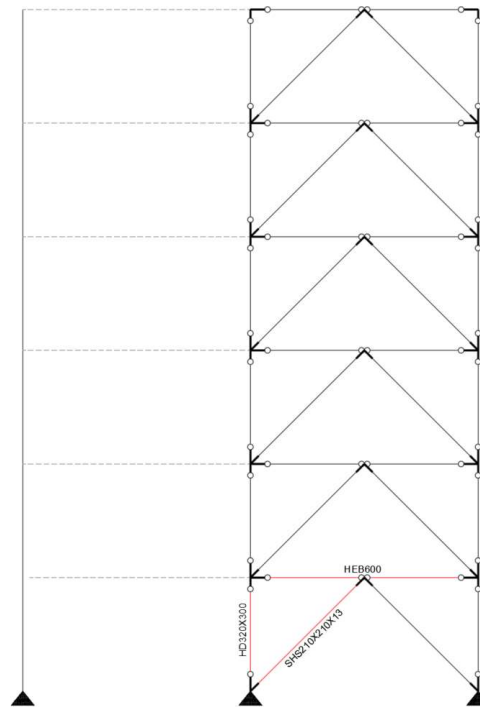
Structural members referred in sections 4.4.2, 4.4.3, 4.4.4 and 4.4.5.
